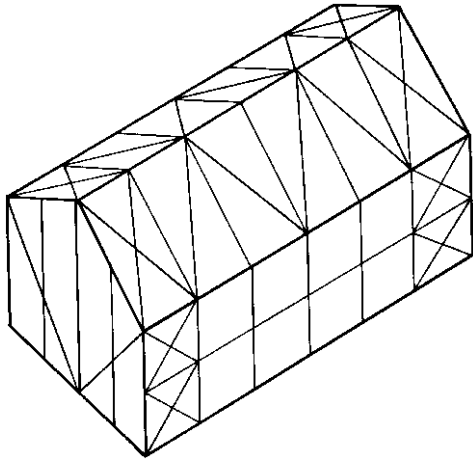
X bracing carries lateral loads from roof to foundation.
